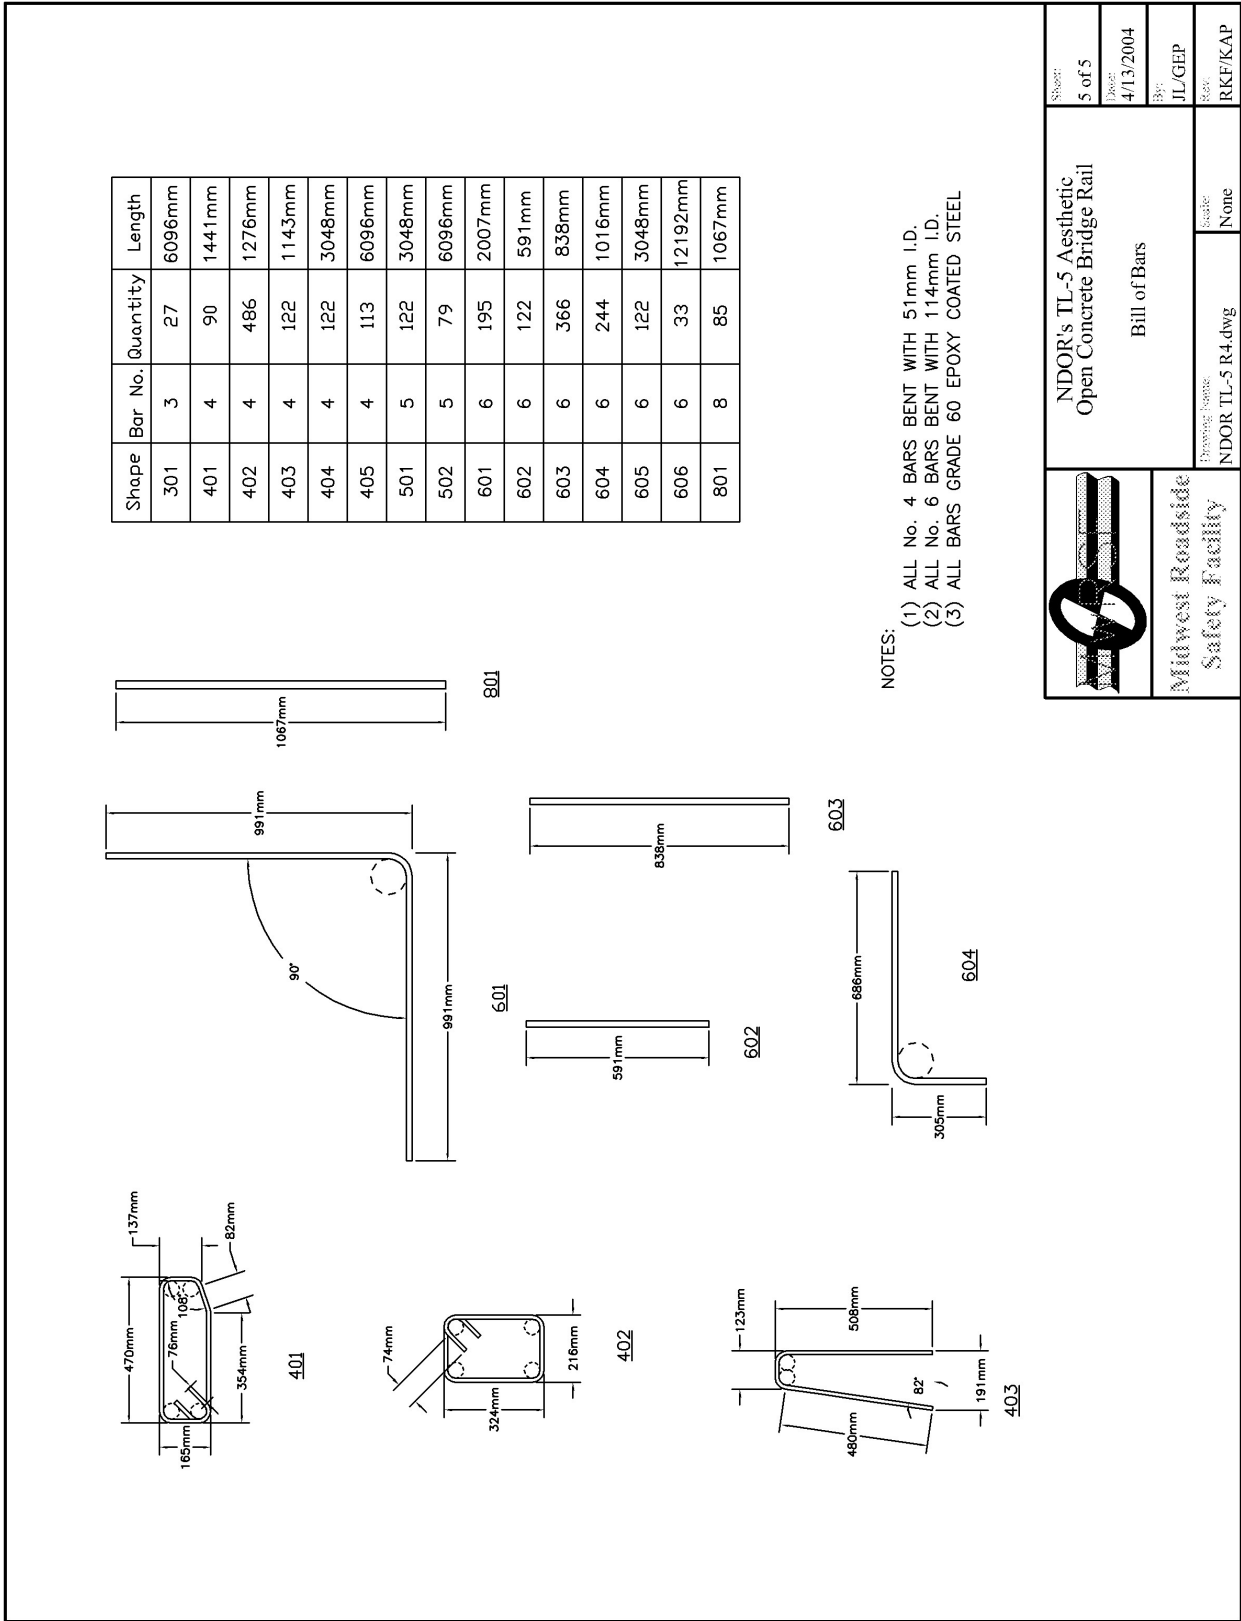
NDOR's TL-5 Aesthetic Open Concrete Bridge Rail Design Reinforcement Details
